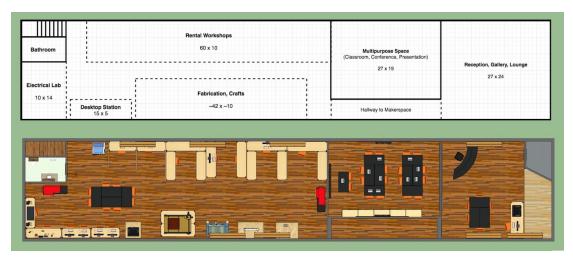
Main floor layout and schematics. The top floor plan shows that the modules present on the ground floor are the reception area, multipurpose space, rental workstations, fabrication/crafts area, desktop station, and electrical lab.
